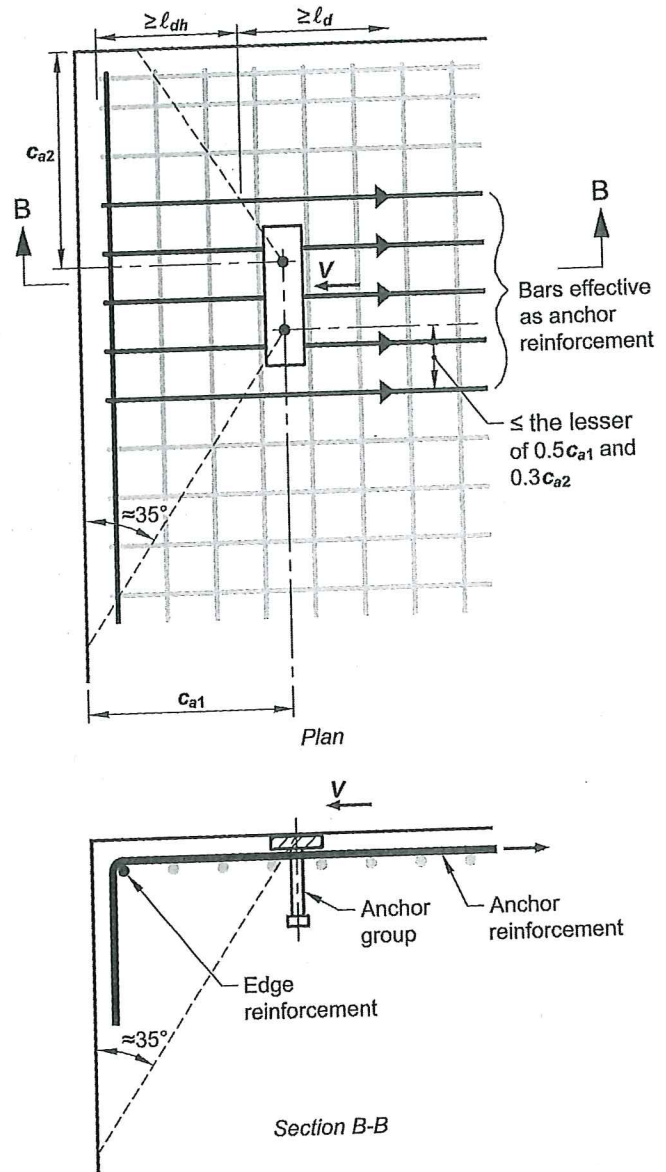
Edge reinforcement and anchor reinforcement for shear.
